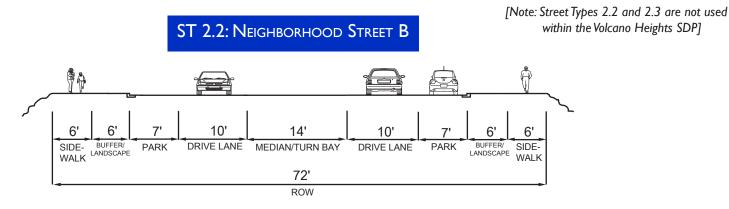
STREET TYPE 2.2: NEIGHBORHOOD STREET B
